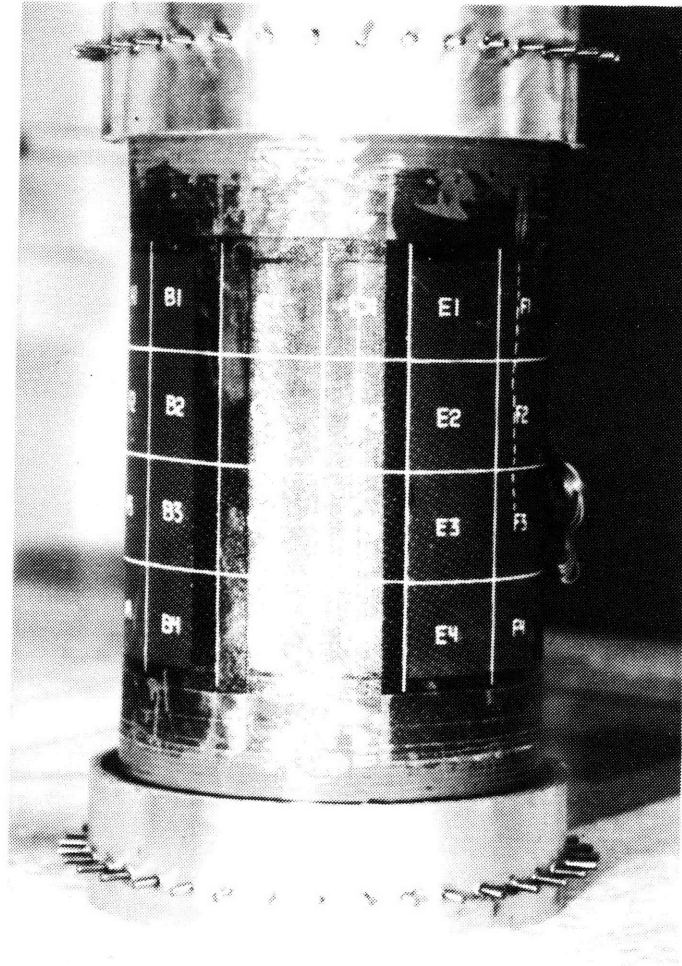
Photograph of Cylinder Ridge Reinforcement
